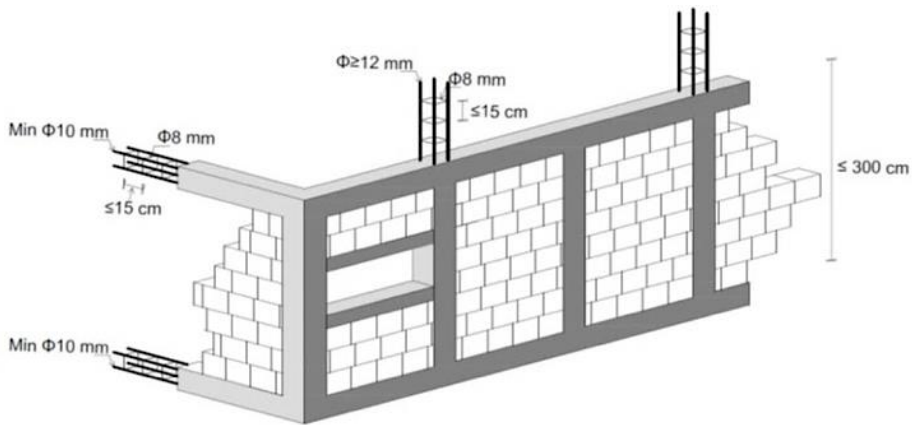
Detailed design of horizontal and Vertical tie beams in load-bearing walls [modified from source 29]
